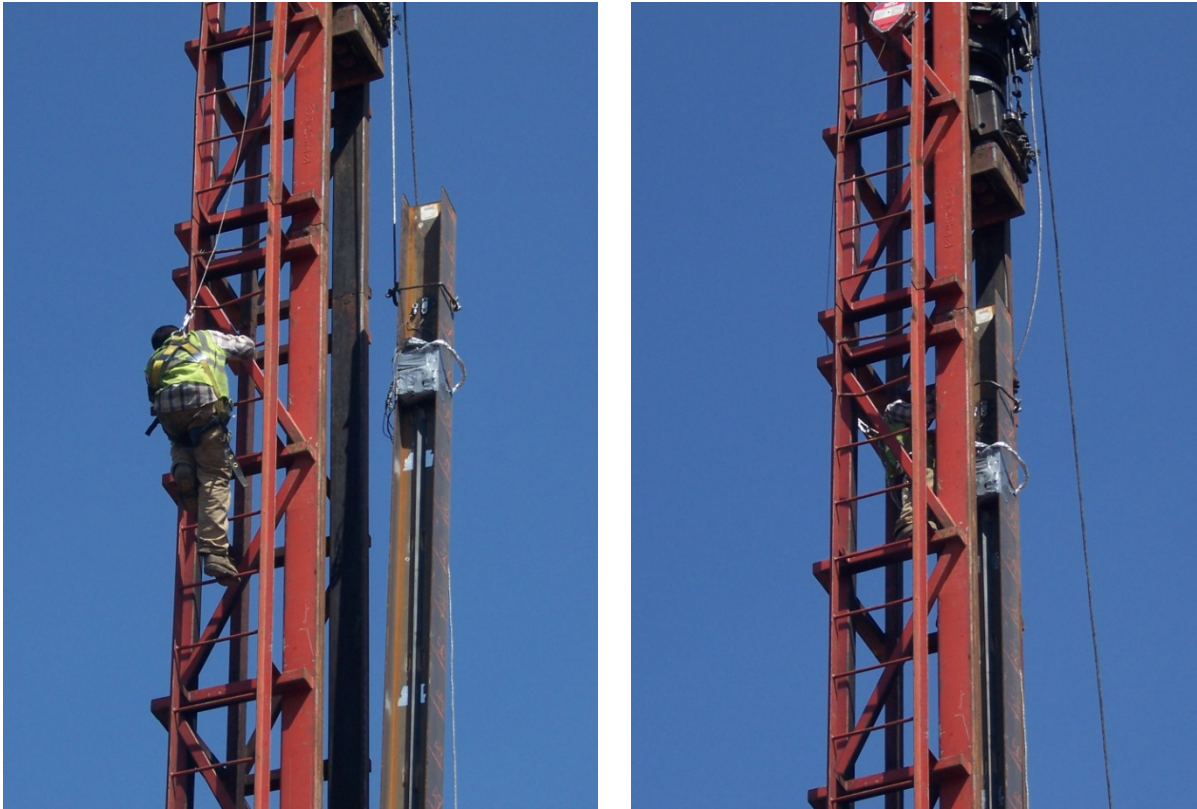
ISU4 Test Pile Lifted into Position via Pile Driving Hammer (Left) and Hammer Helmet Guided into Place via Construction Worker (Right)
